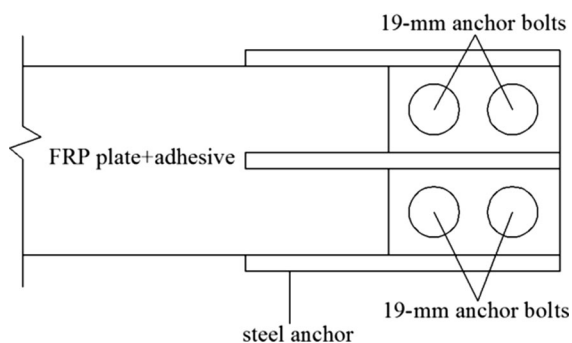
Fixed anchor installed at the end of the beam (El-Hacha et al. [36])
